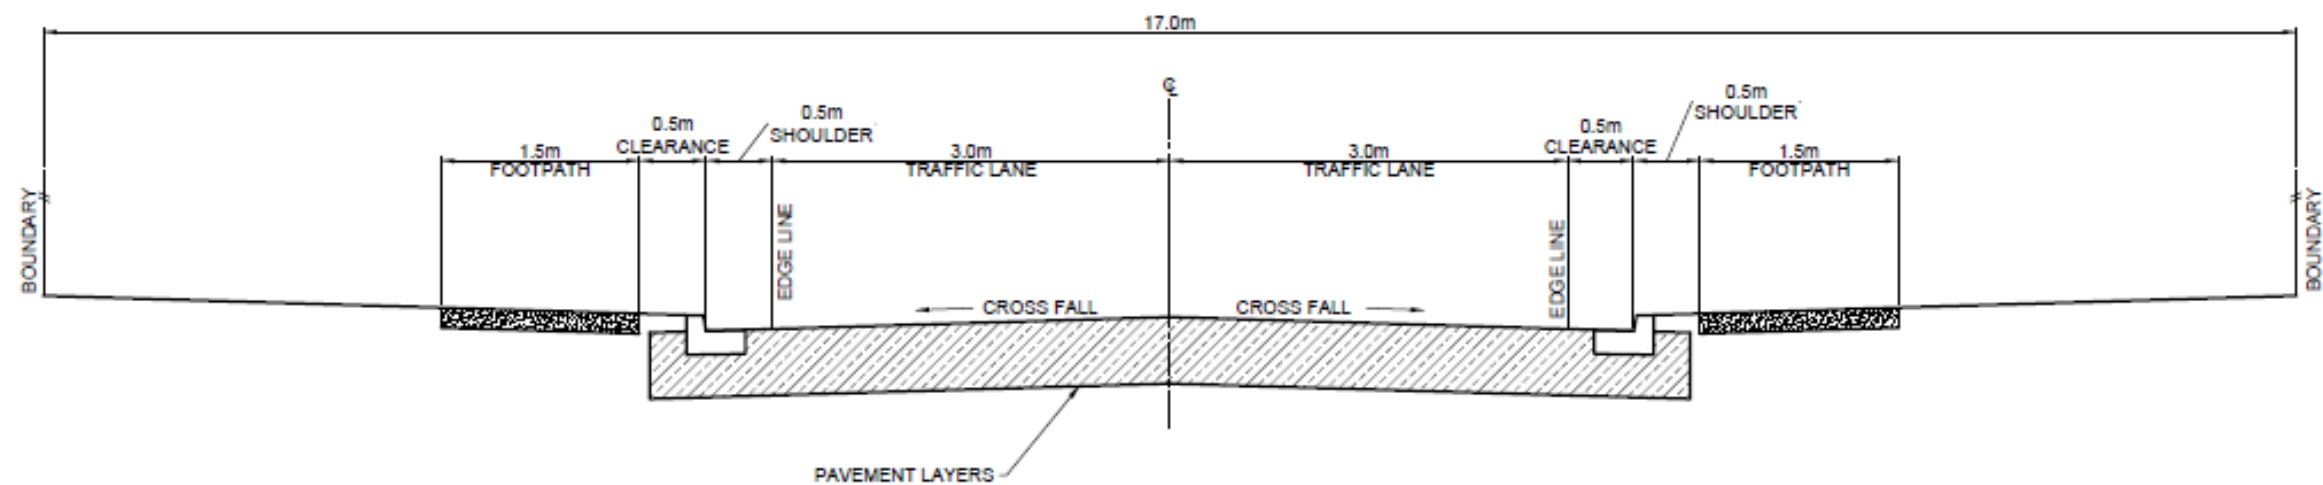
Lorenzen Bay Structure Plan - Road cross sections
